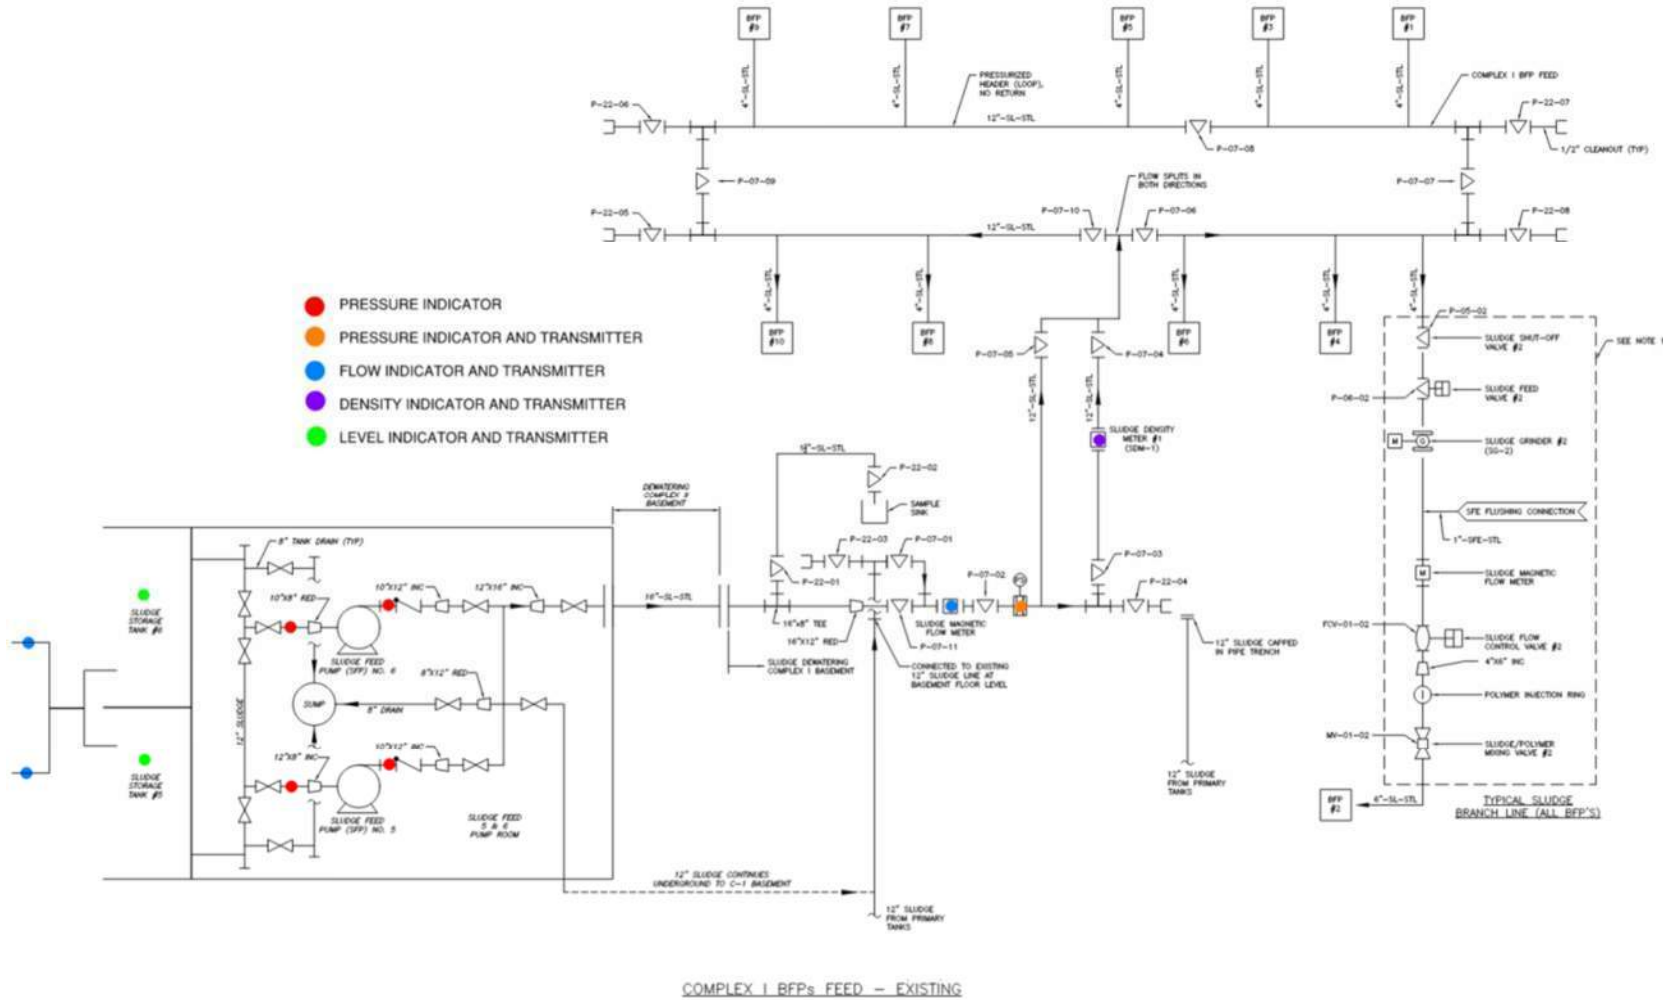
C-I Sludge Feed System Schematic – Instrument Locations
